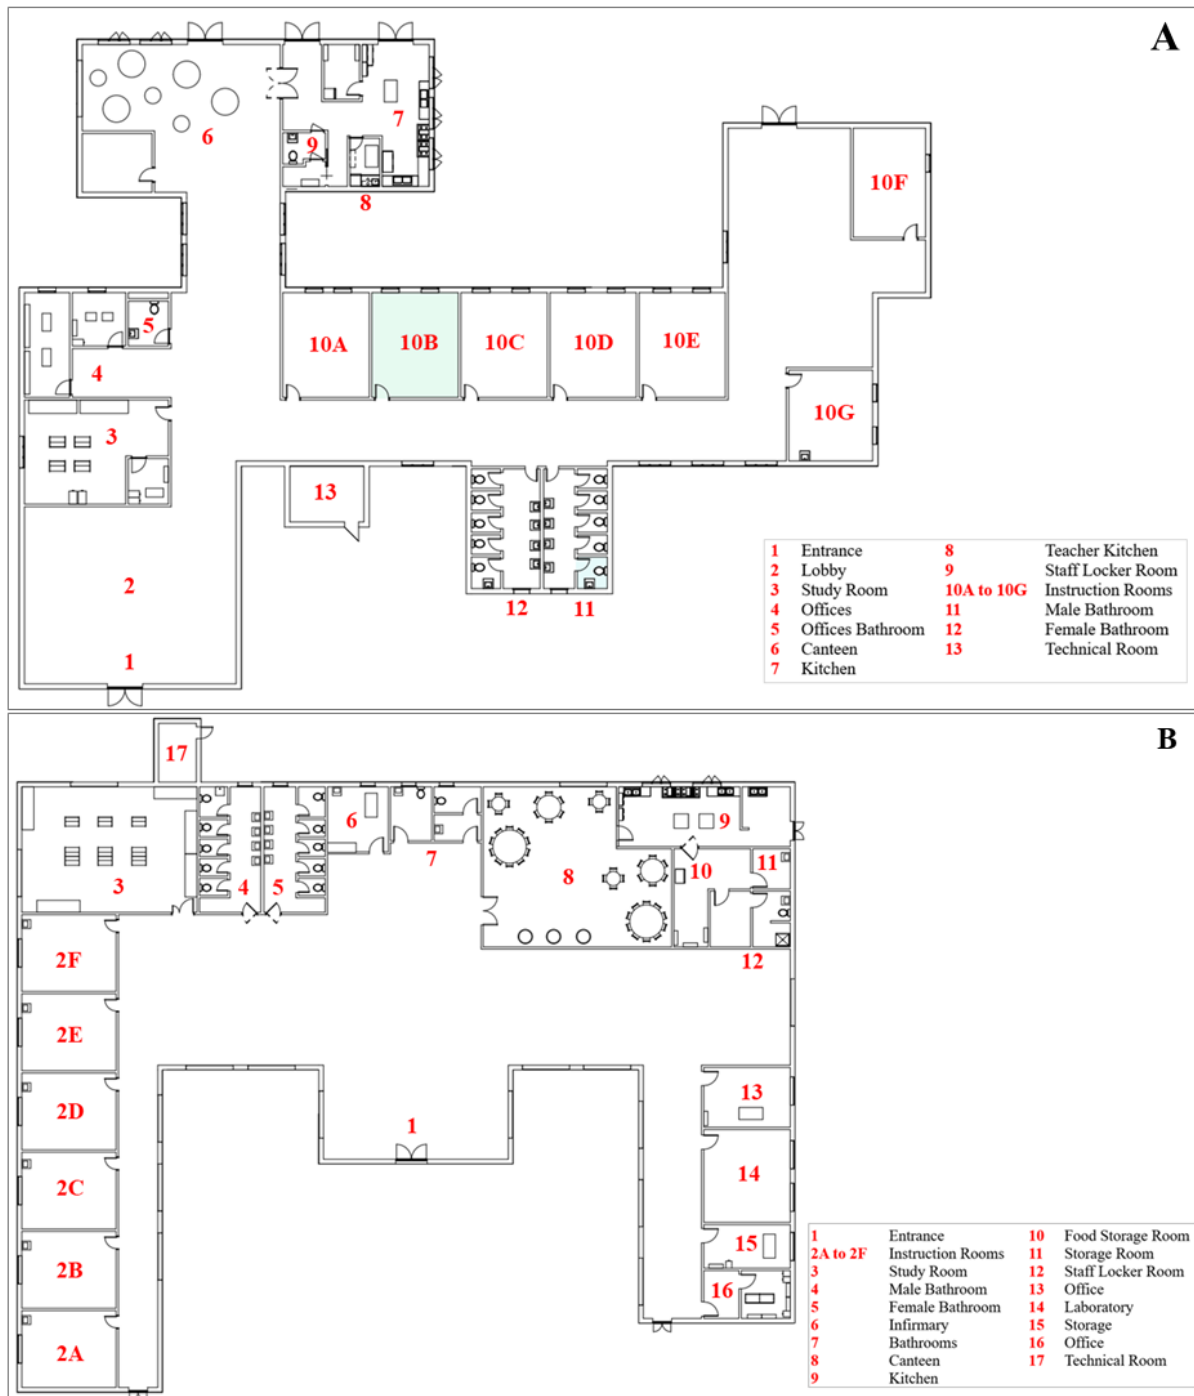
Layout of the two fictitious buildings, with their corresponding section legends: A) Building 1, B) Building 2.
